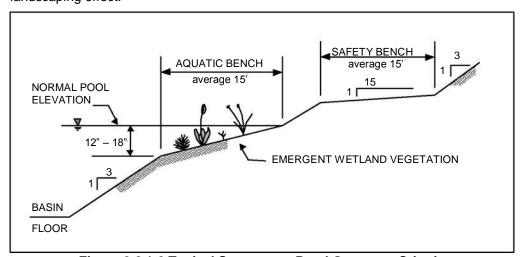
Typical Stormwater Pond Geometry Criteria
